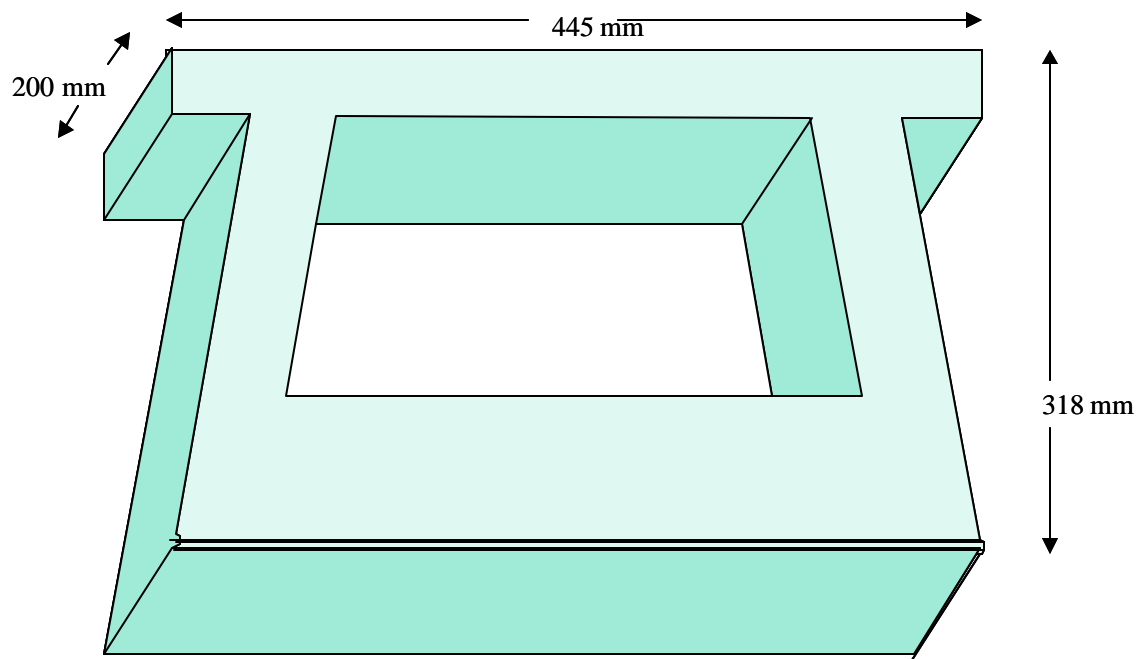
Block from Center Pier Structure (324 N or 73 lb. in weight)
